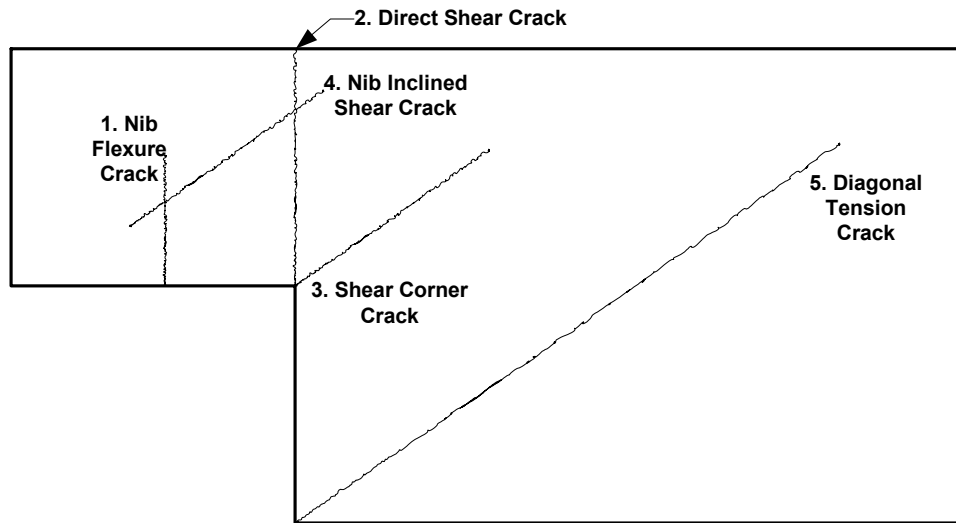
Crack Locations for Dapped End Double Tee Beams
